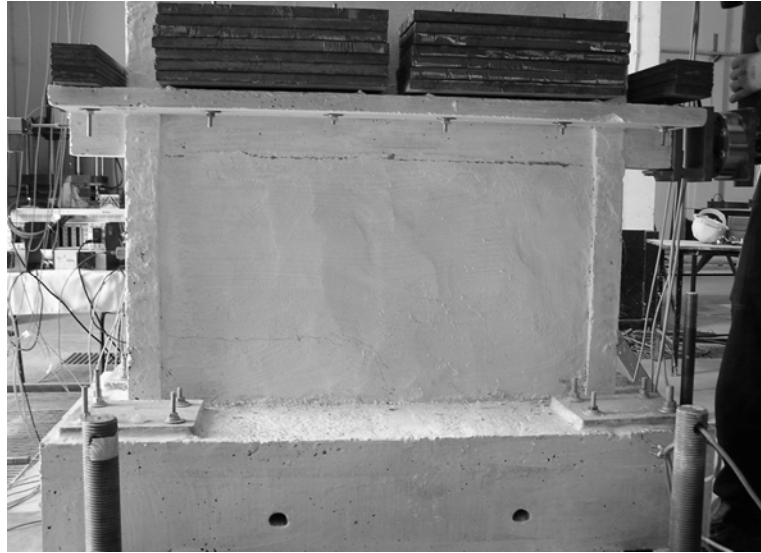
Damage in the first story at the end of the second loading group, south face
